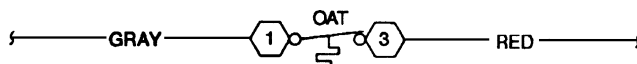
Wiring Connections for Outdoor-Air Thermostat
